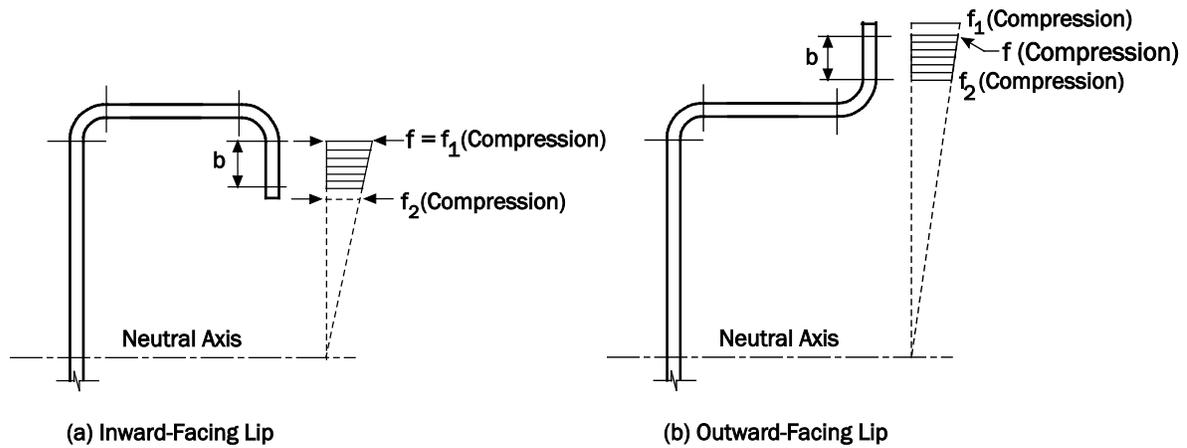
Unstiffened Elements Under Stress Gradient, Both Longitudinal Edges in Compression
